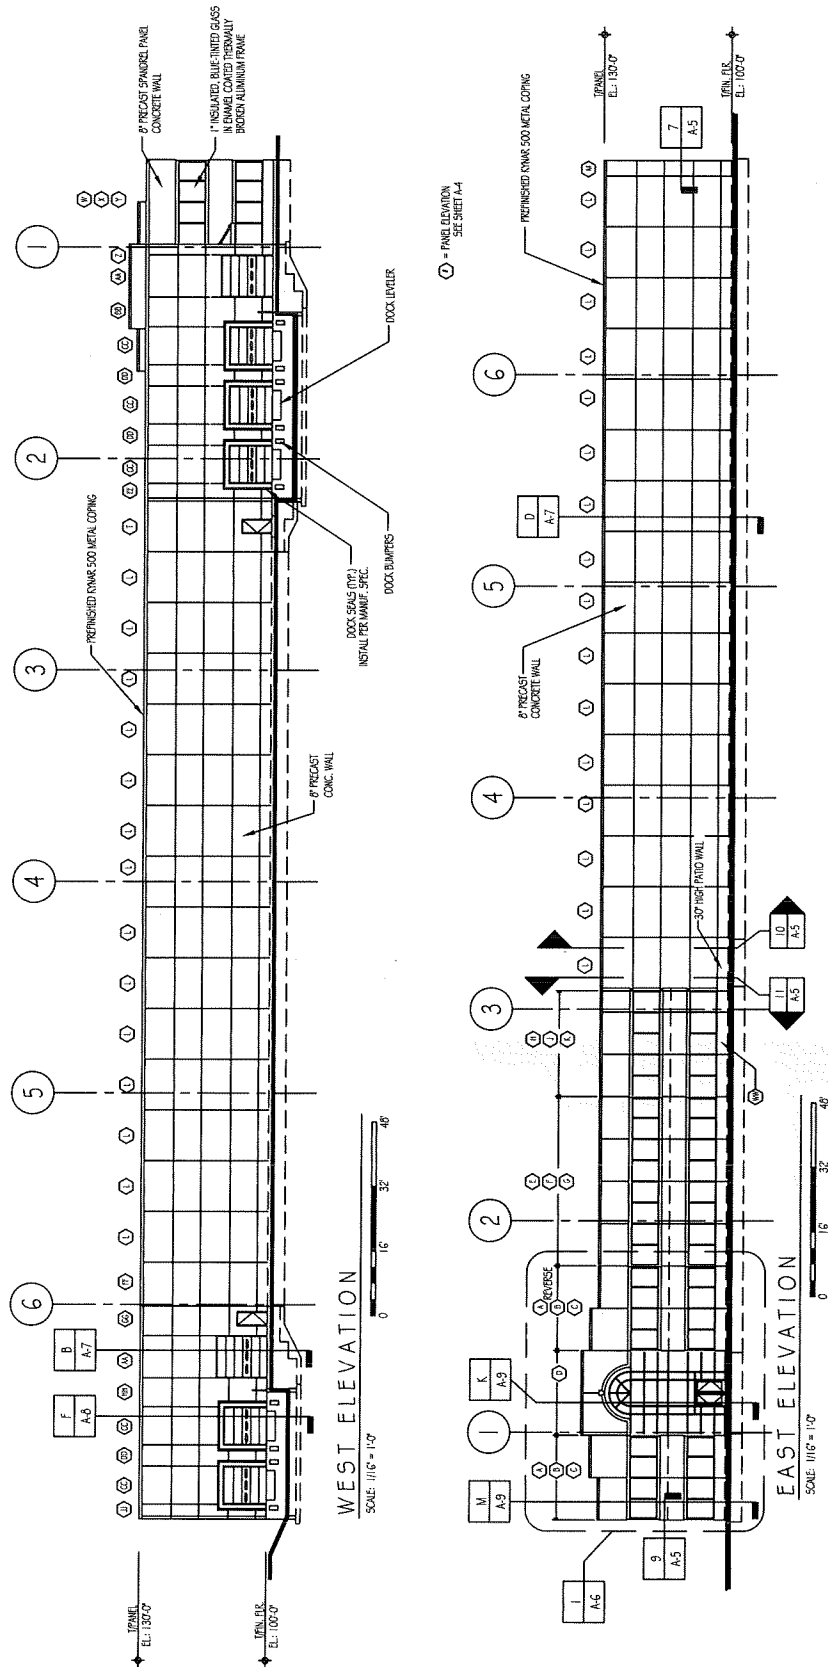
Exterior elevations of a warehouse and office building constructed using tilt-up panels. (Charles E. Smith, Areté 3 Ltd.)
